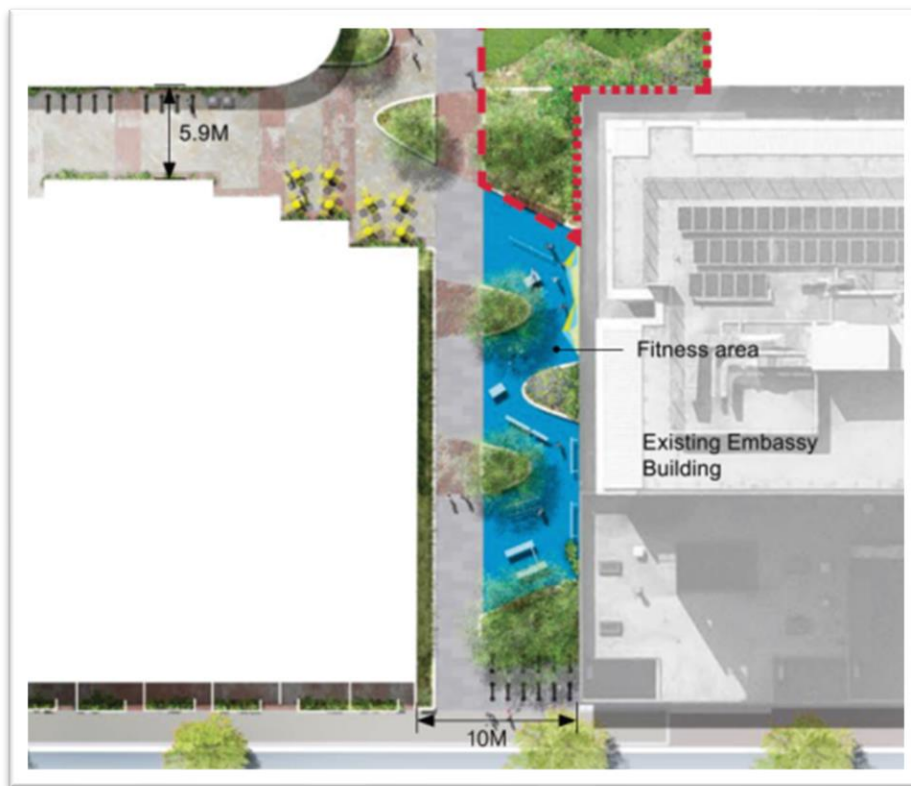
Original layout of Park Lane. Source: Original Development Plan (Gurner 2021)
